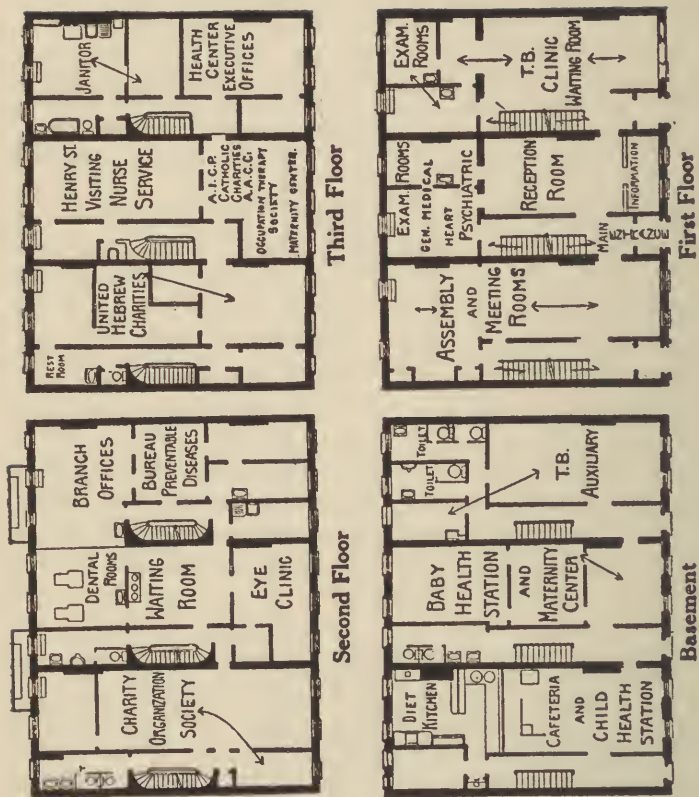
FLOOR PLAN OF THE EAST HARLEM HEALTH CENTER, NEW YORK CITY.
